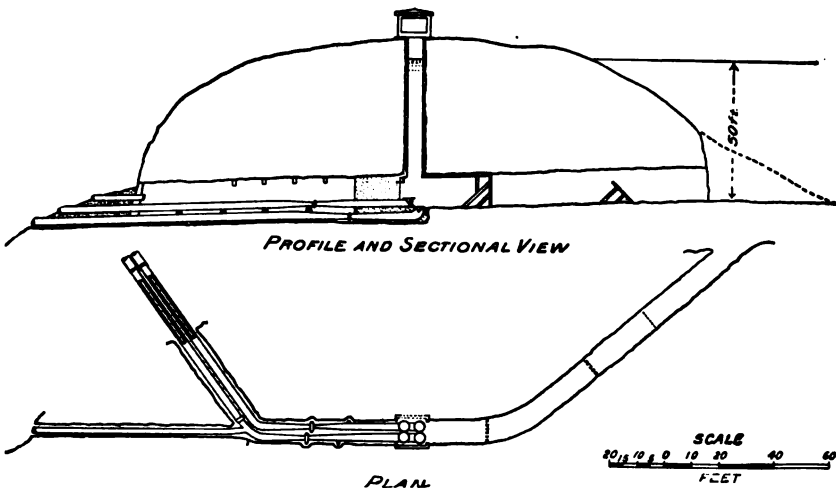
PROFILE AND SECTIONAL VIEW AND PLAN OF WASTEWAY TUNNEL, SWEETWATER DAM.
